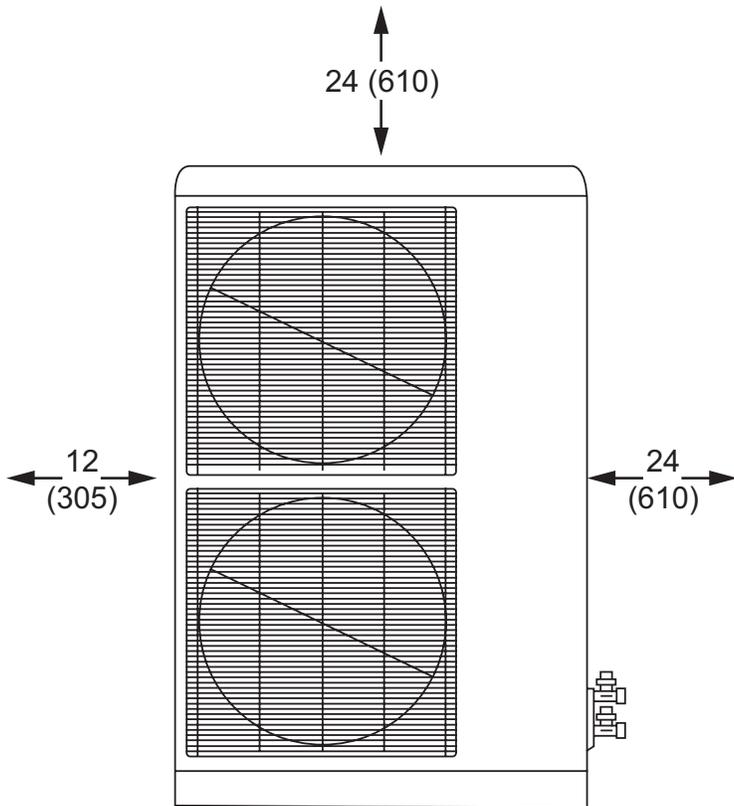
Multi-Zone Outdoor Unit Dimensions - Inches (mm)
